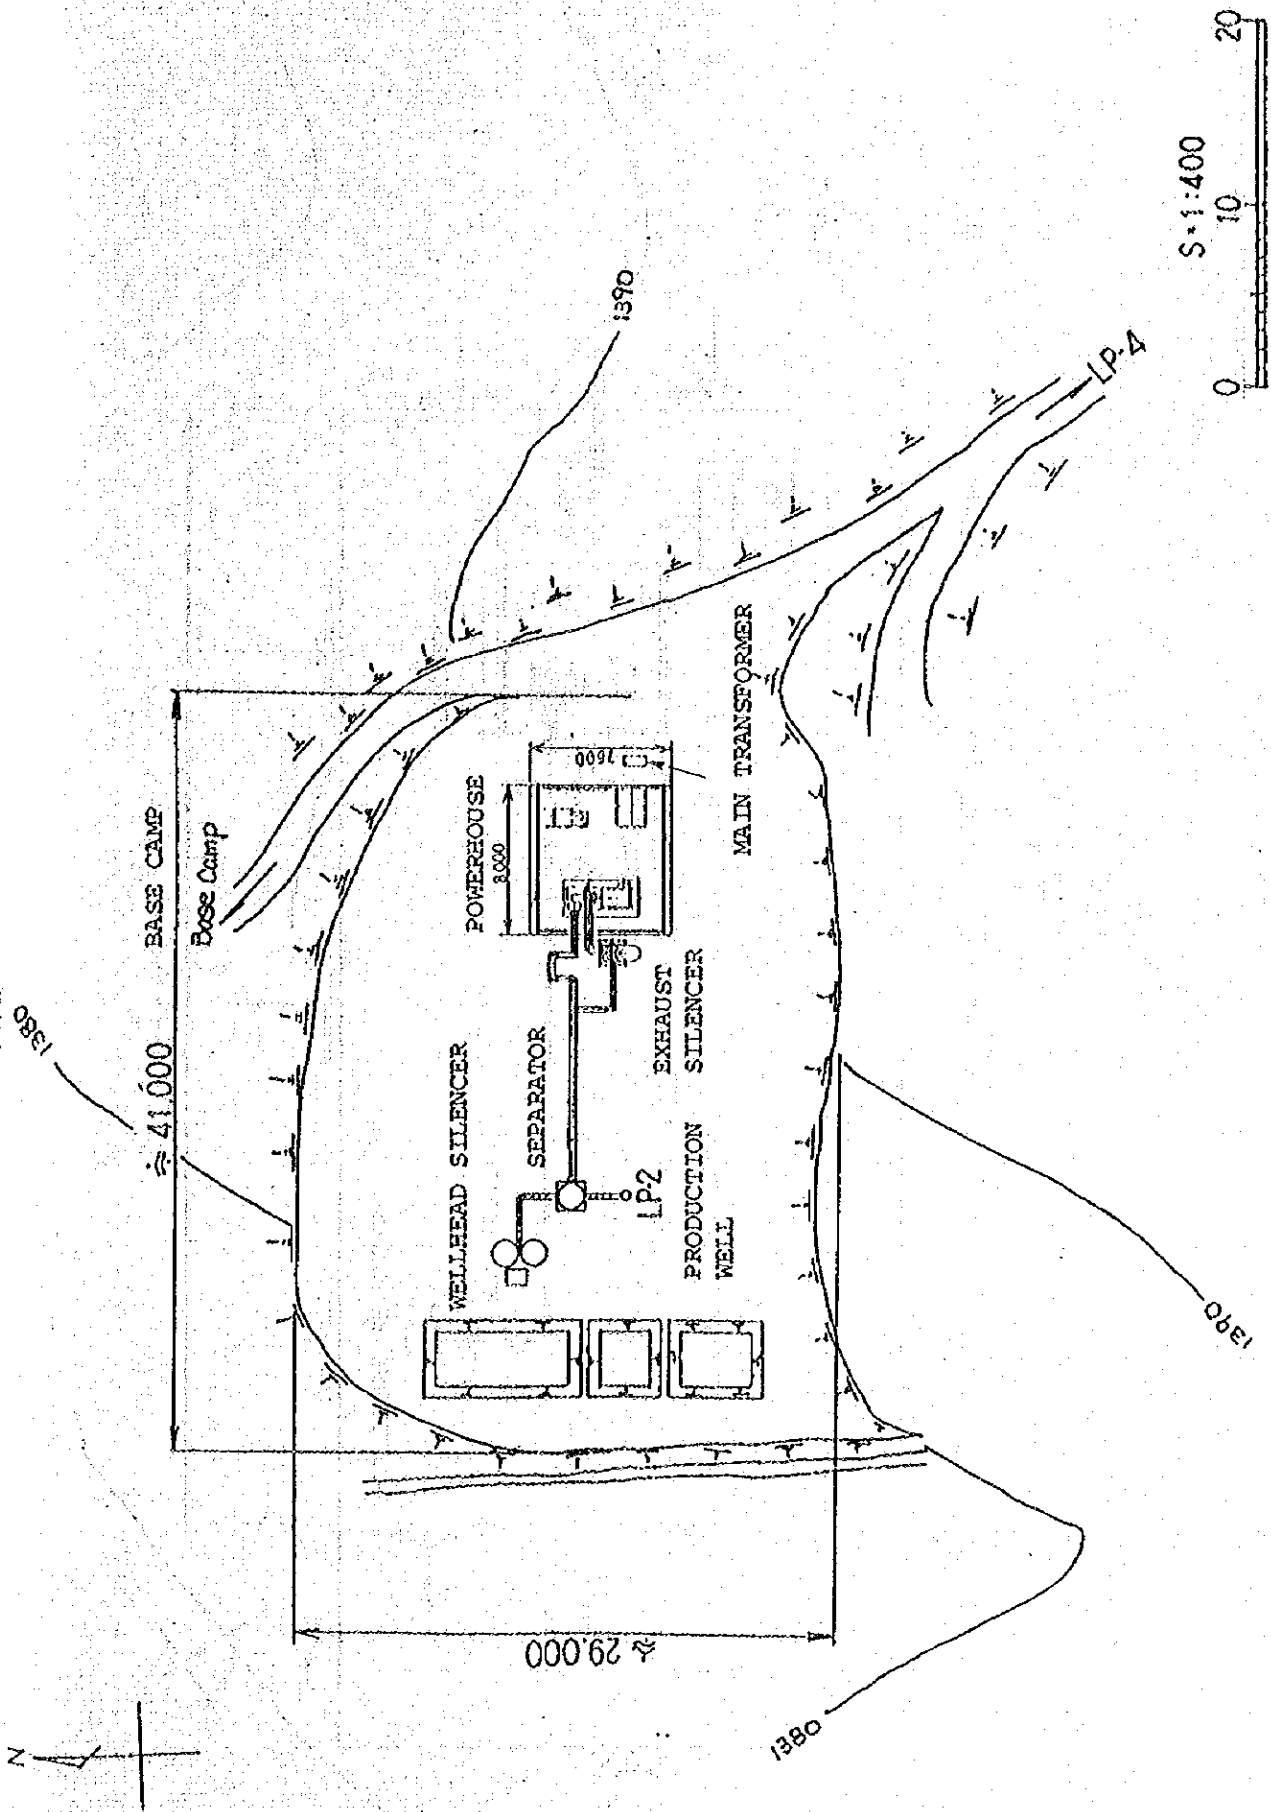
PLOT PLAN OF NO. 1 UNIT POWER PLANT
